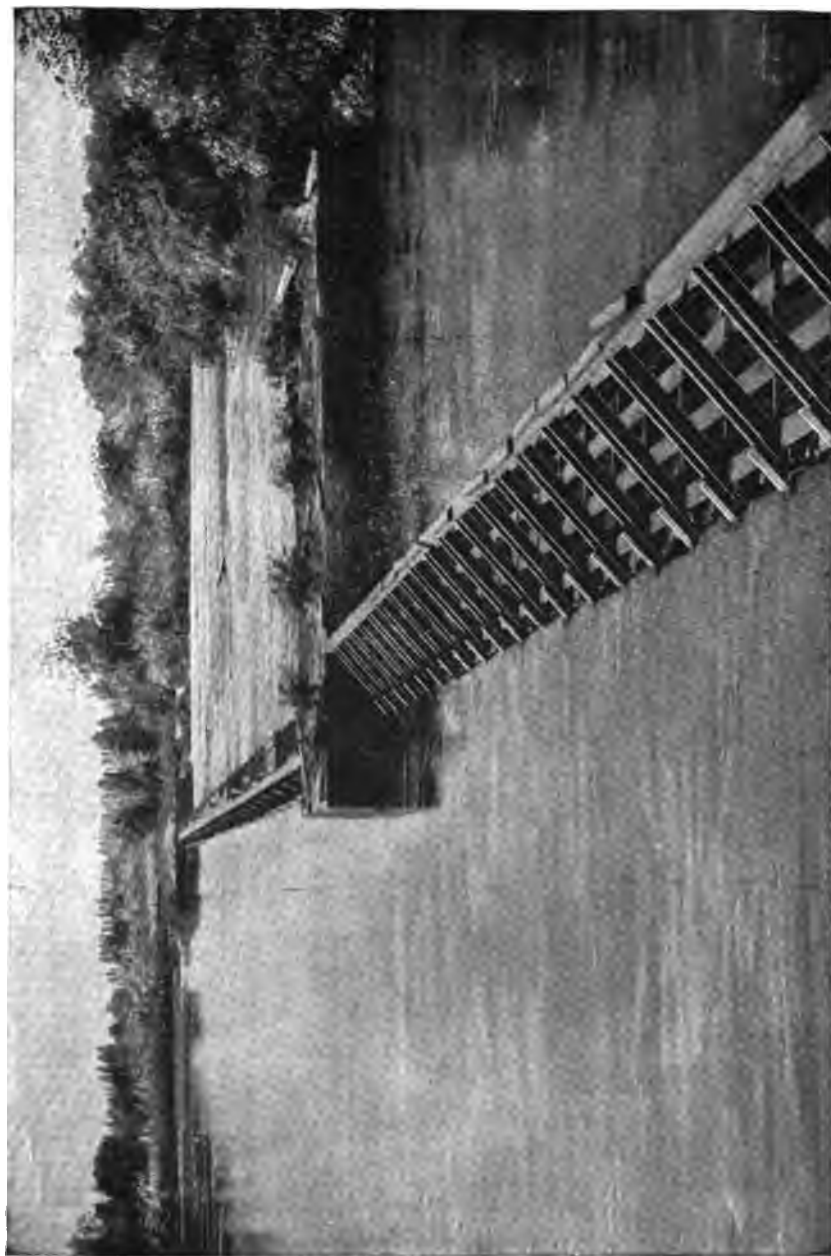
PLATE IV.—Kern River Diversion Weir. Head of Calloway Canal.
